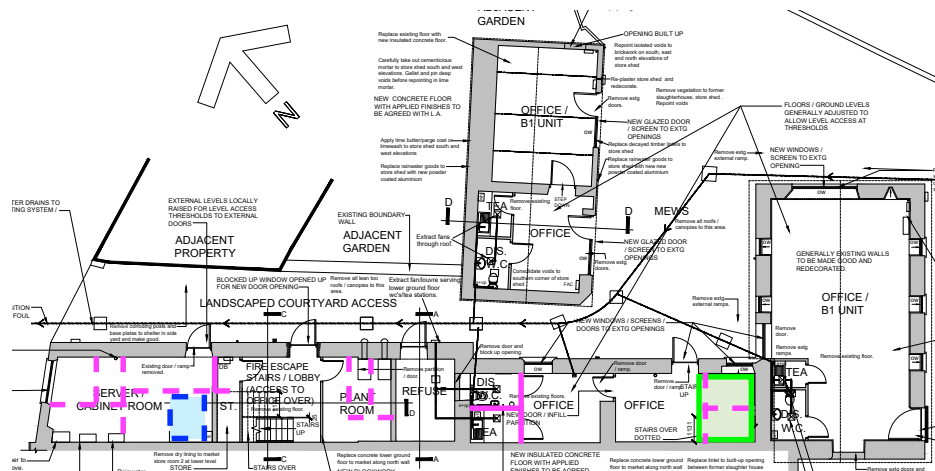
above: Proposed lower ground floor plan – Source Pembroke Design Ltd (see Figure 81 for key)
